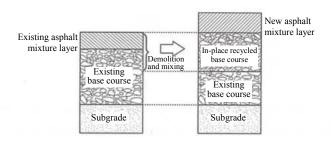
Example of stabilization using existing pavement "as is"
